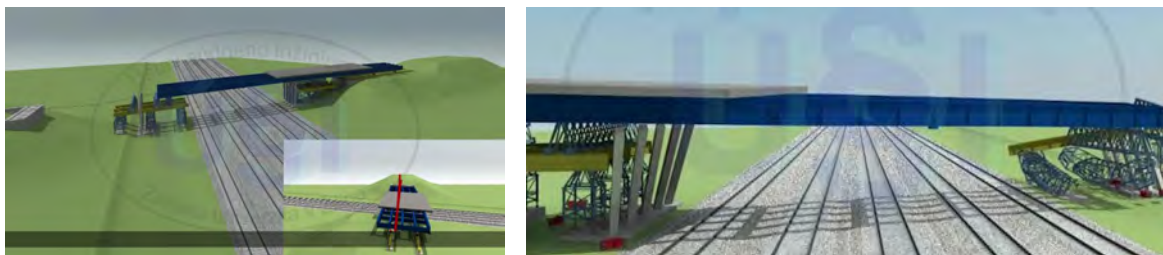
Collapse of the bridge superstructure launching back in its final position
